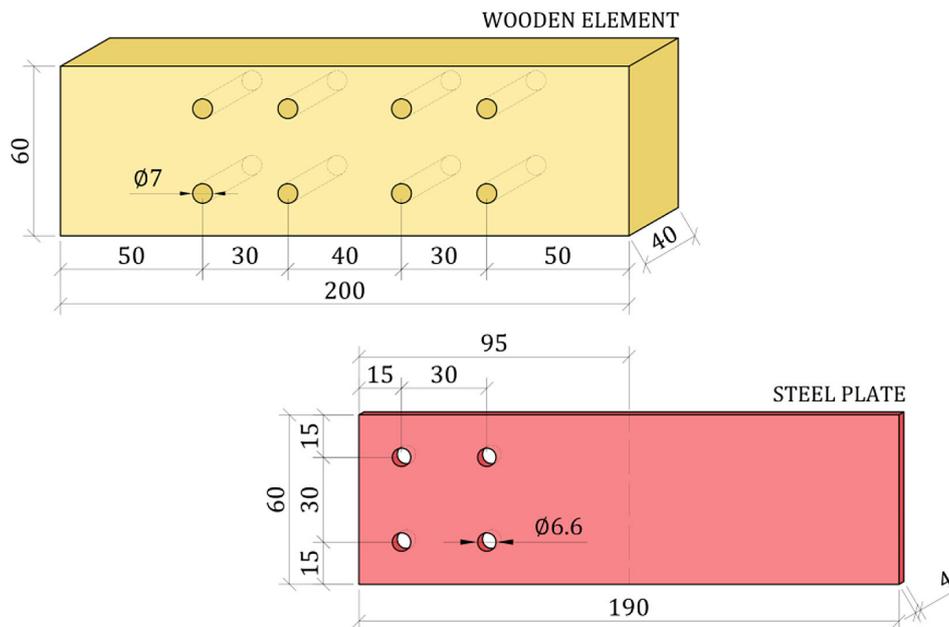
Openings pattern in wooden element (yellow) and in steel plate (red) – dimensions in mm
